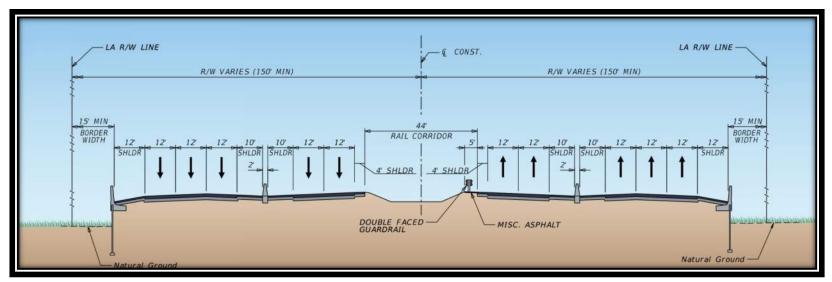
Proposed Typical Section (6 GUL + 4 EL with rail envelope) - E. of Central Florida Pkwy. to SR 528
